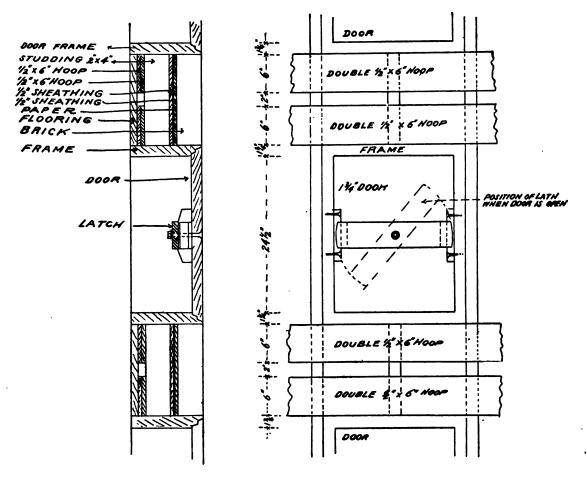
COMBINATION CEMENT SILO (DETAIL OF DOOR CONSTRUCTION).
